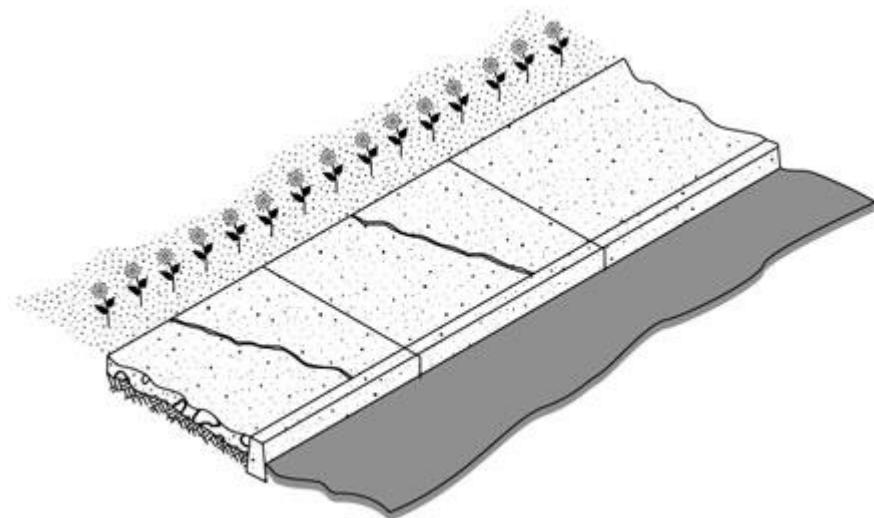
Transverse Cracking of Concrete (<http://irc.nrc-cnrc.gc.ca>)
